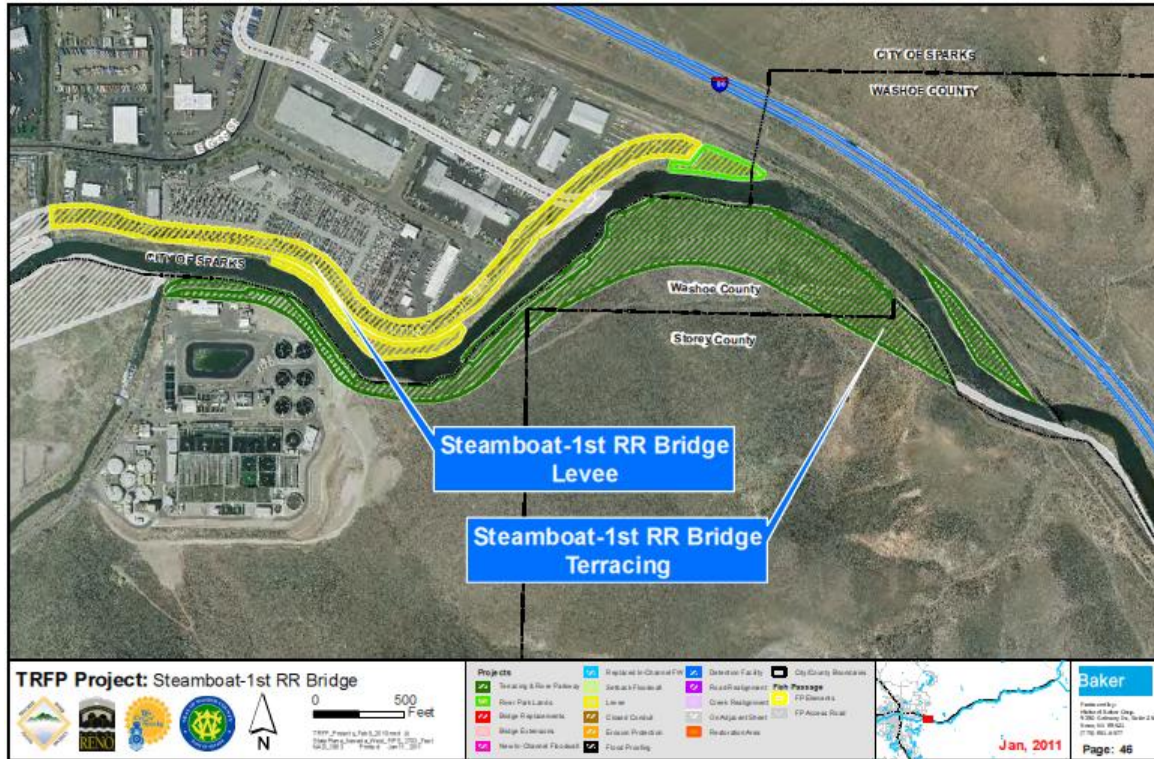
TRFMA Preliminary Project Plans for Steamboat to 1st Railroad Bridge
